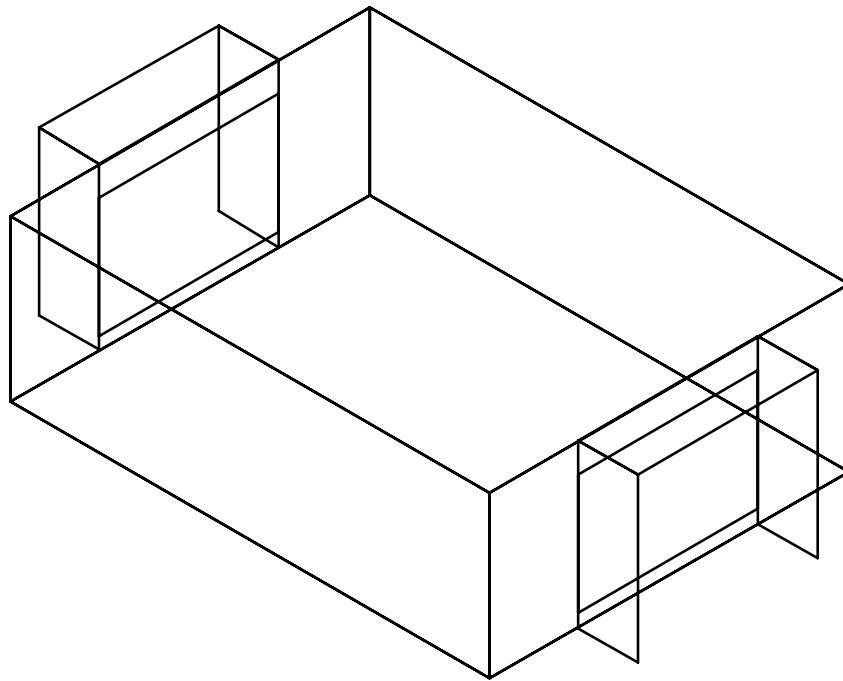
Building with East/West Window Orientation and Shade Overhang and Shade Fins added (Case 630) - Isometric View of Southeast Corner
